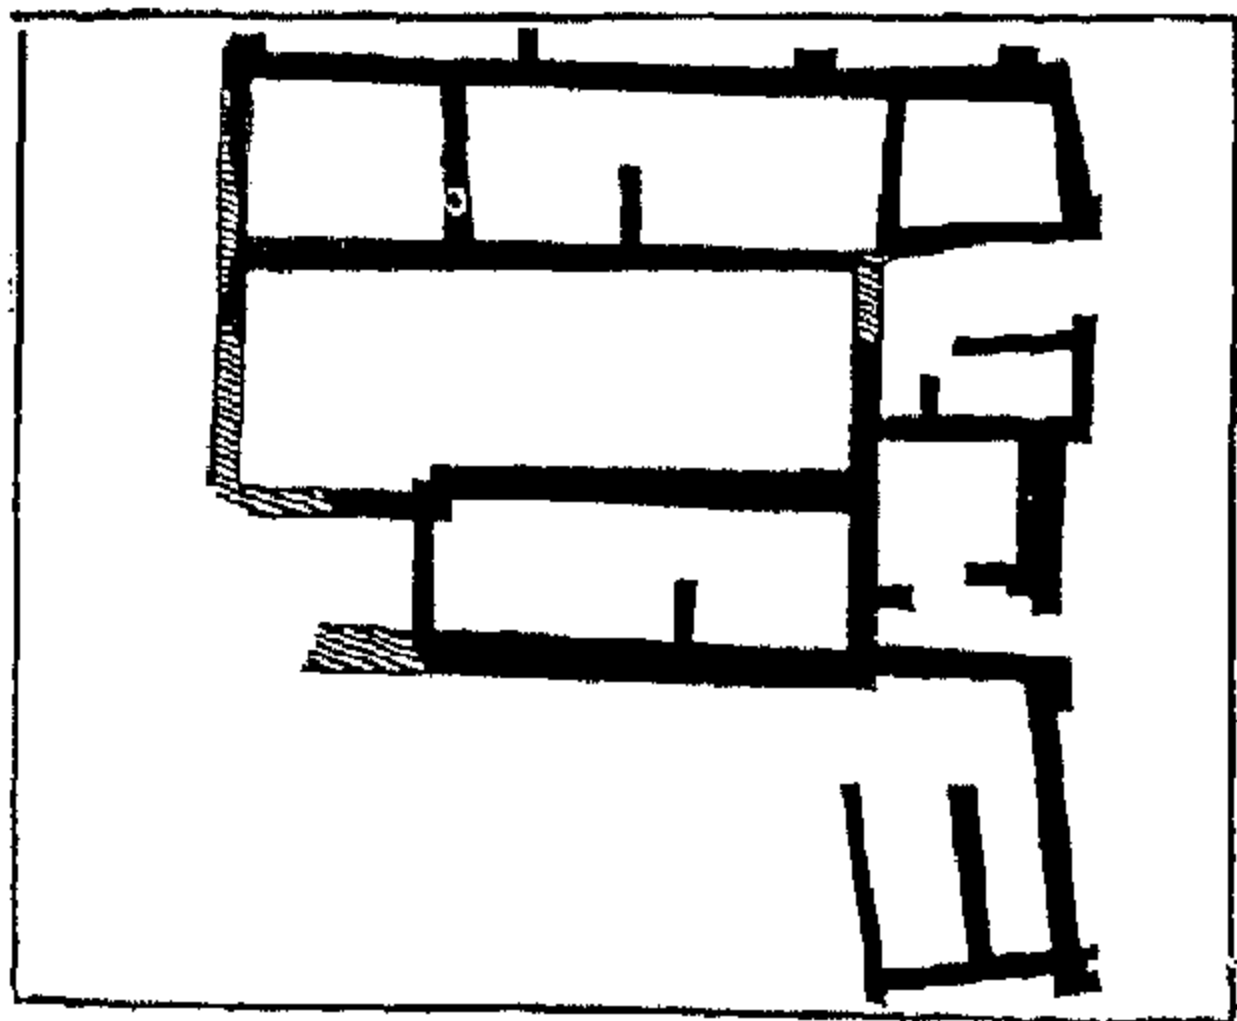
Plan of House in level XVIII at Tepe Gawra (after Tobler 1950, pl. XIX).
